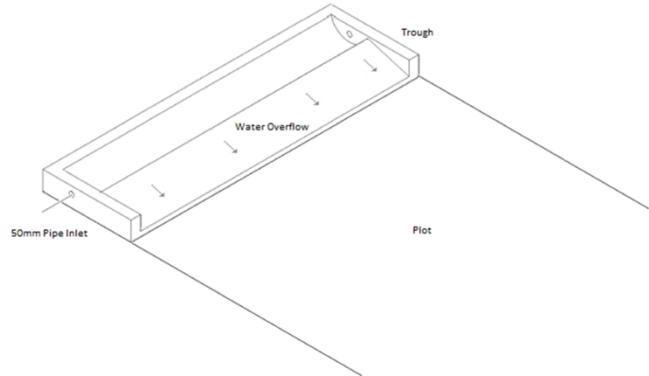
Fabricated concrete outfall troughs installed at the top of each bay.
